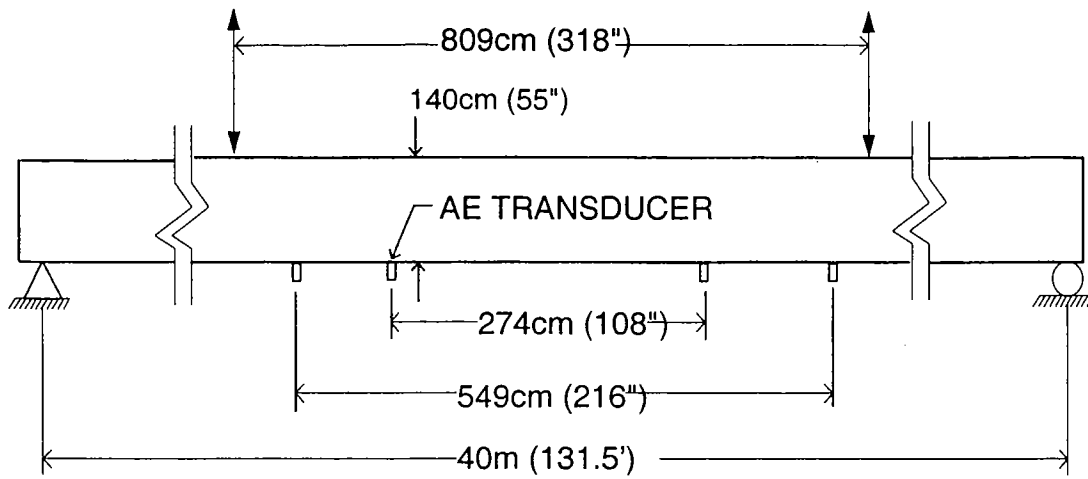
Location of AE transducers on Prestressed Bridge Girder
